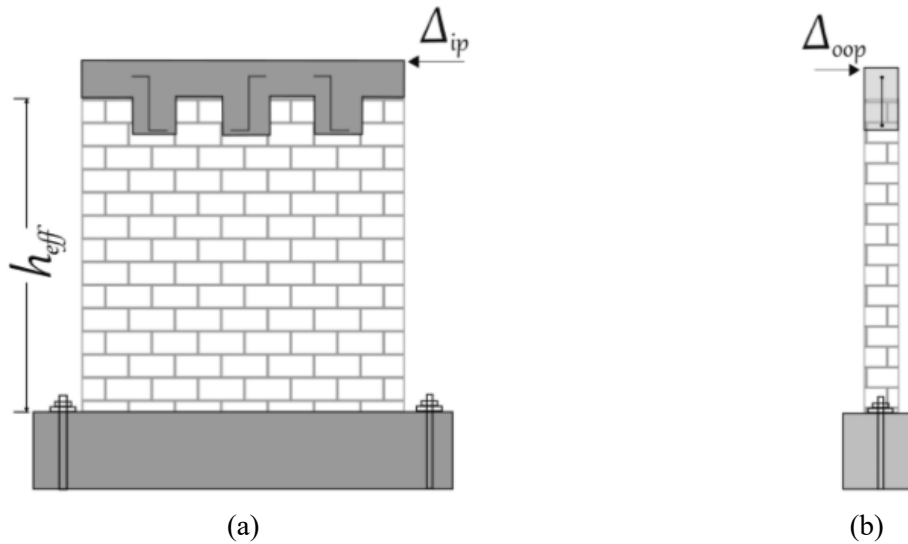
URM wall tested by Krishnachandran and Menon (2023): (a) IP loading, and (b) OOP loading
